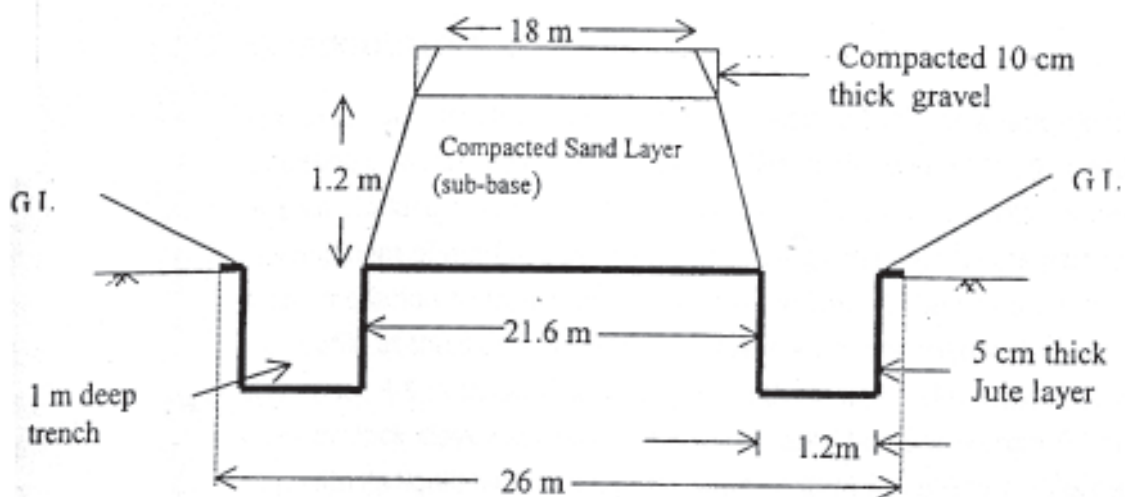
Cross - Section of the pavement improved with jute geotextile.
